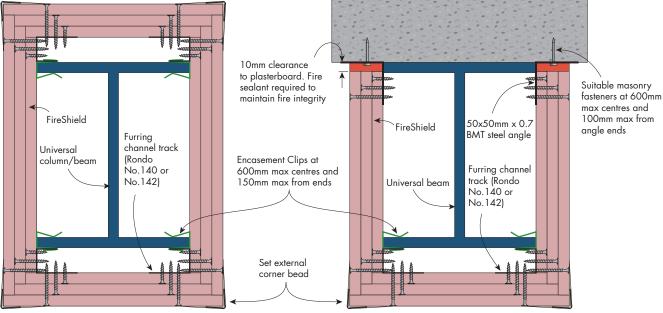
4 Sided Protection For I-Beam/Column Elevation or plan view
